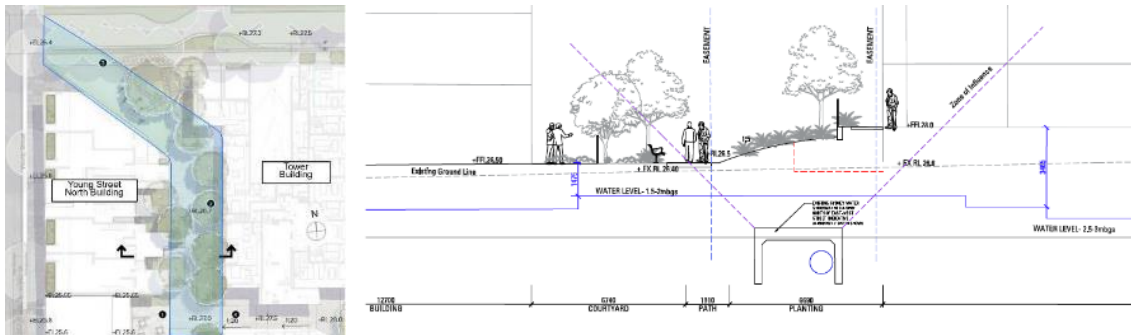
'Deep soil' above the Sydney Water culvert, at the north-western corner of the site, between the Tower Building and Young Street North Building. The culvert is approximately 5m below ground level.
